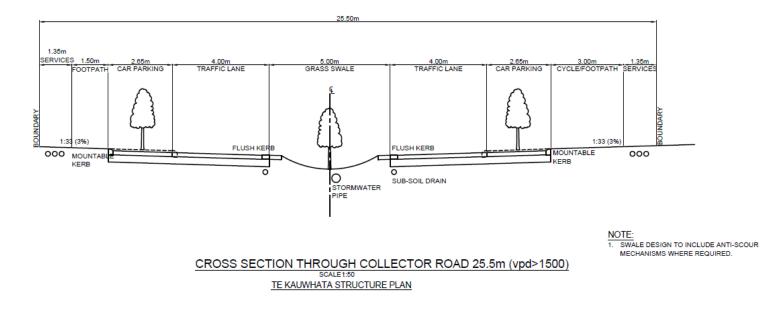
Te Kauwhata Structure Plan - road cross sections - collector roads
